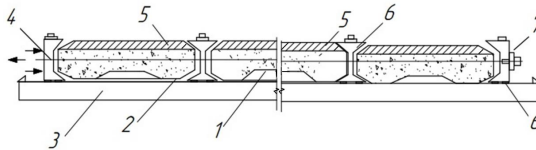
Diagram of a Device for Manufacturing Pre-Stressed Small Reinforced Concrete Elements:
